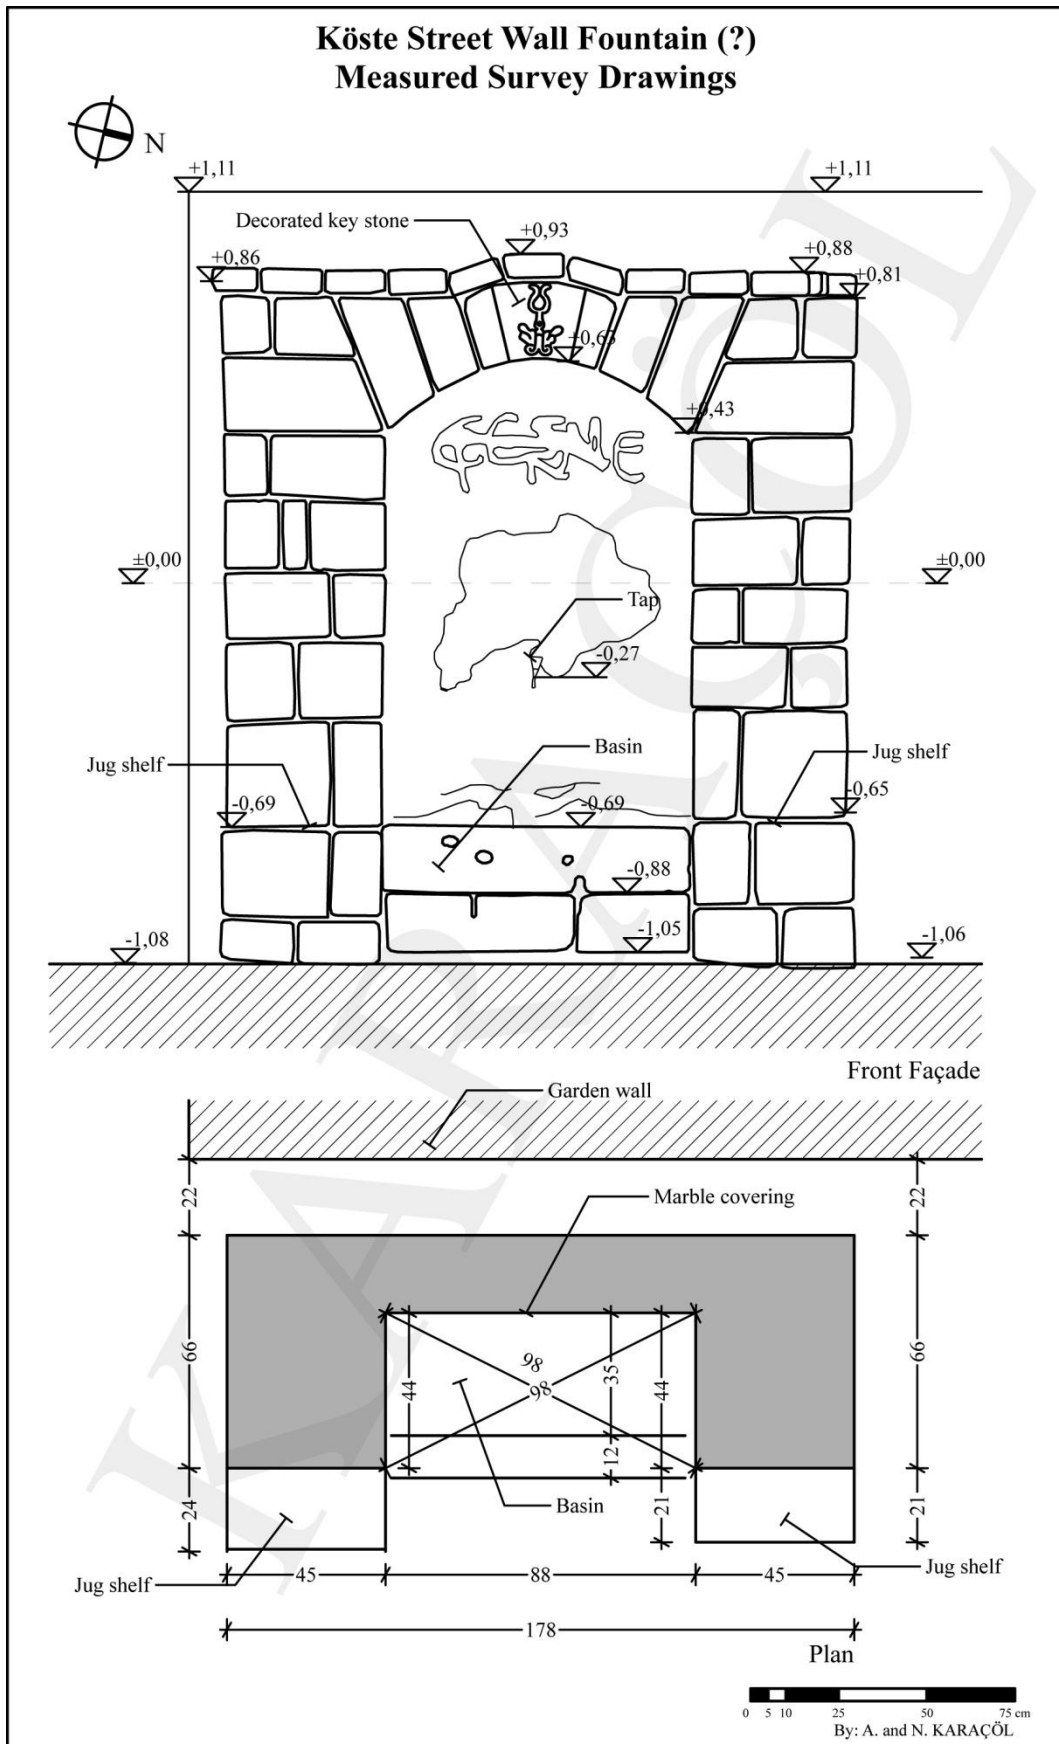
Köste Street Wall Fountain front façade and plan drawings
